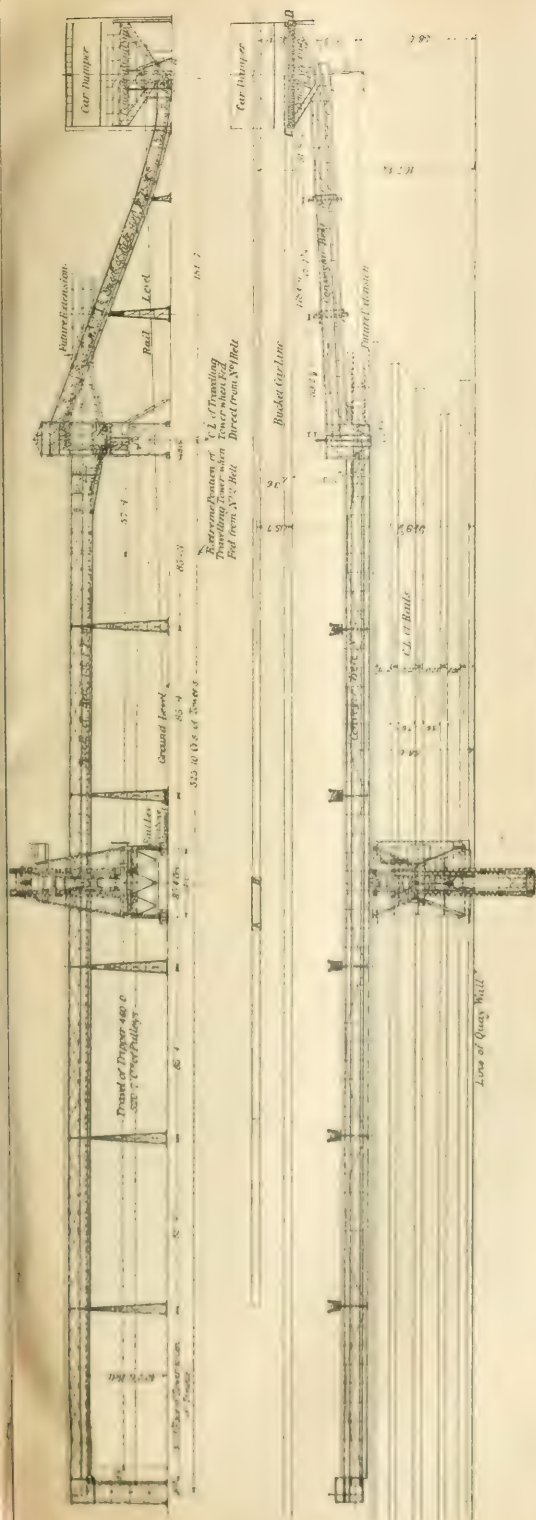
GENERAL ARRANGEMENT OF PLANT.
